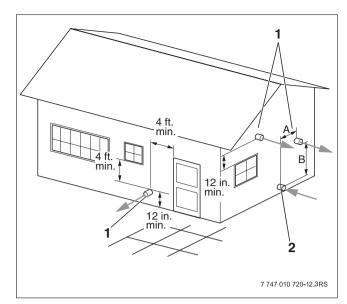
Specified clearances to ANSI Z223.1 for horizontal flues
